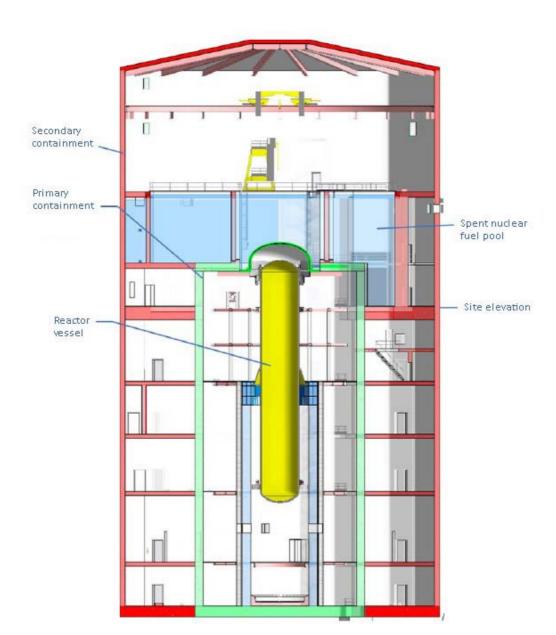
Reactor Building – Schematic cross-section through the primary containment of the BWRX-300 reactor (source: GE Hitachi)
